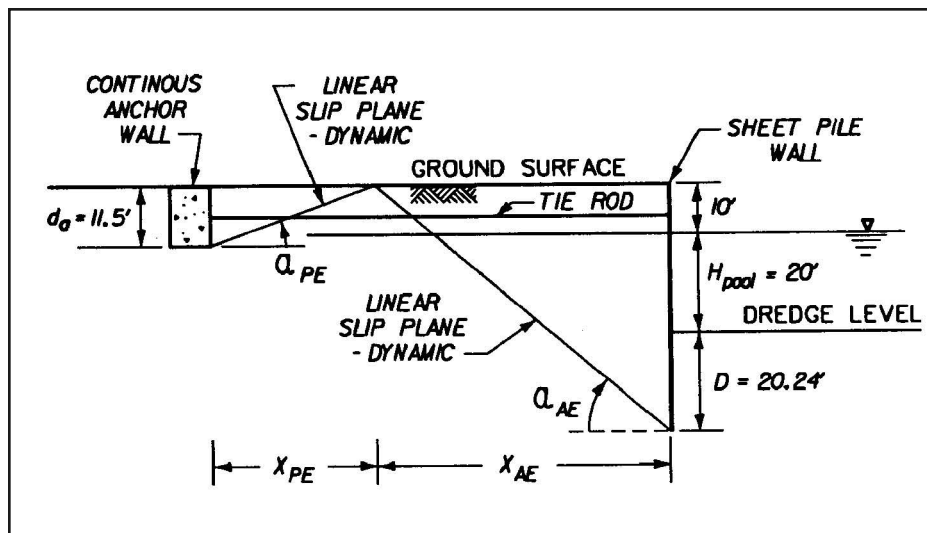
Simplified procedure for siting a continuous anchor wall
